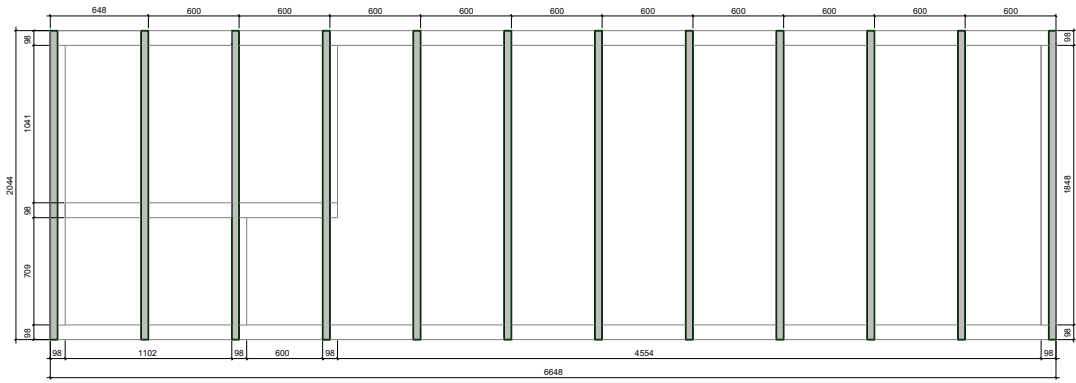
CONSTRUCTIONAL ROOF PLAN BEFORE BUILD
